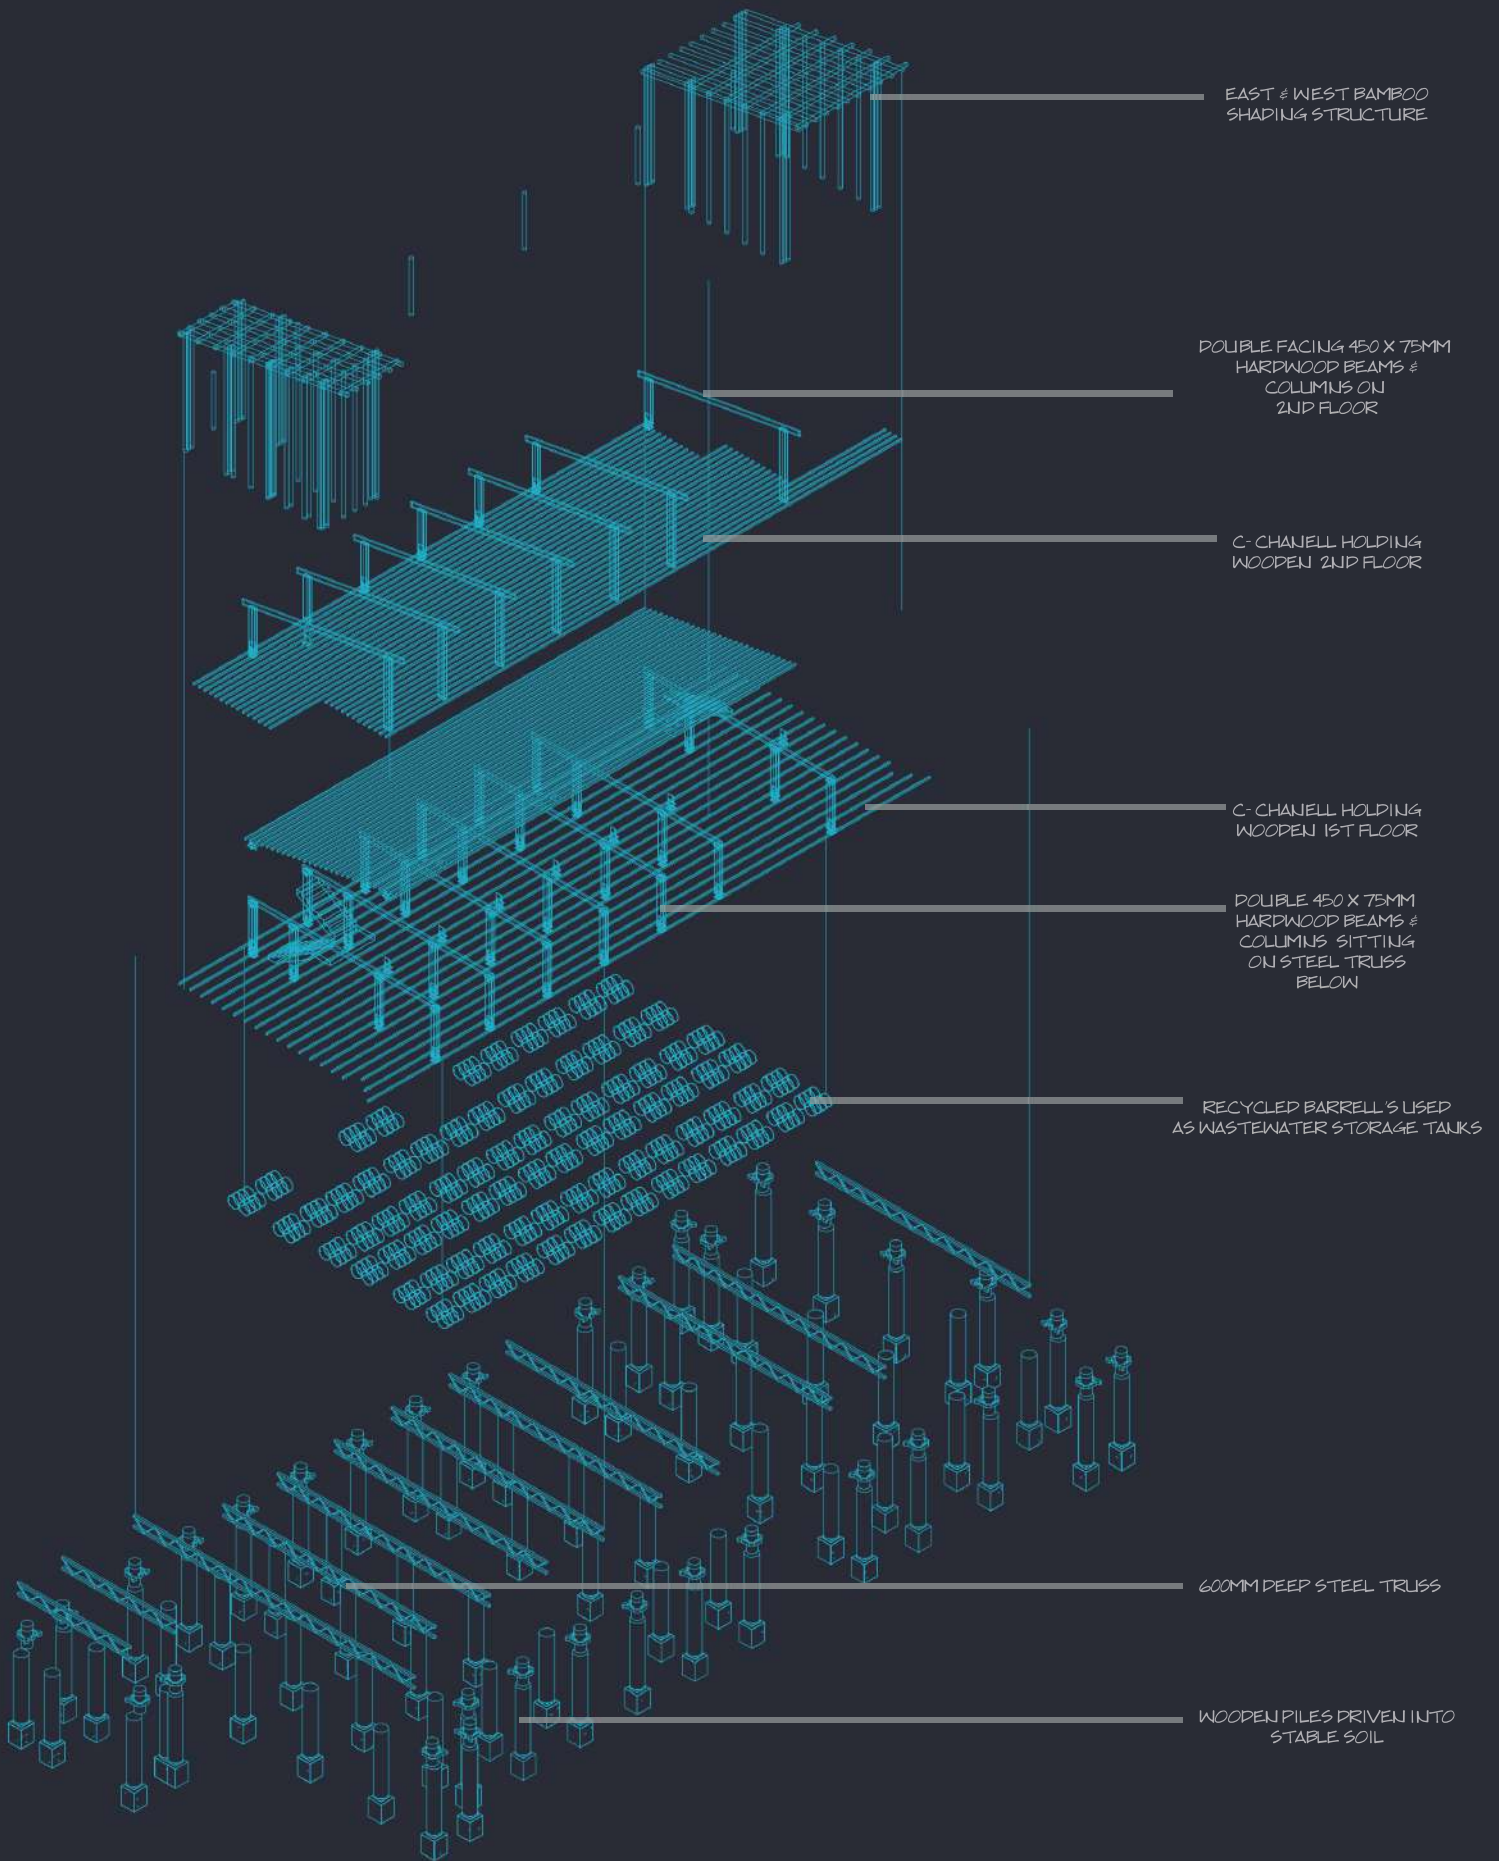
Exploded structural axo entire Farmhouse building
